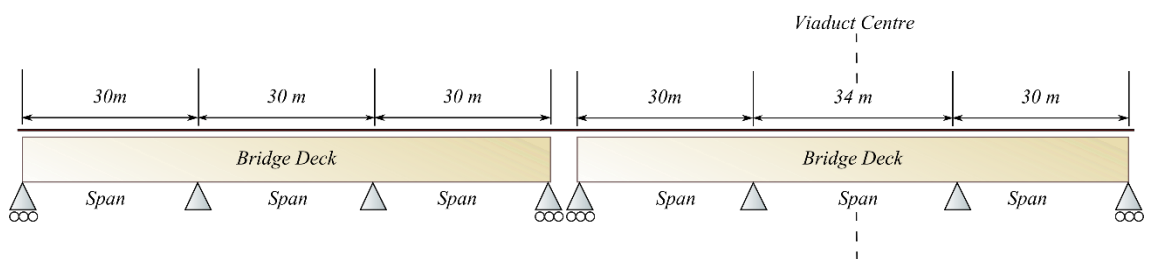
Example arrangement of bridge decks at Rainham Viaduct.
